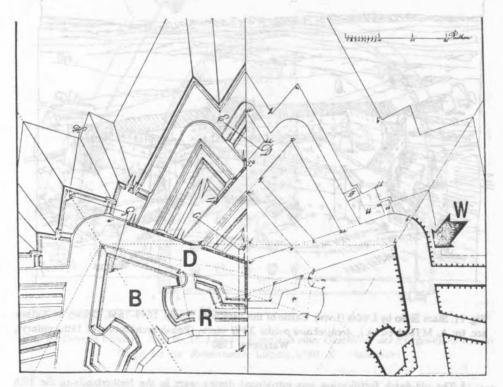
Vauban's 1st system of fortification. Acc. to: A. Zastrow, Handbuch der vorzüglichsten Systeme und Manieren der Befestigungs-Kunst, Berlin 1828. B - bastion, R - main rampart, D - ditch, W - brickwork escarpment
